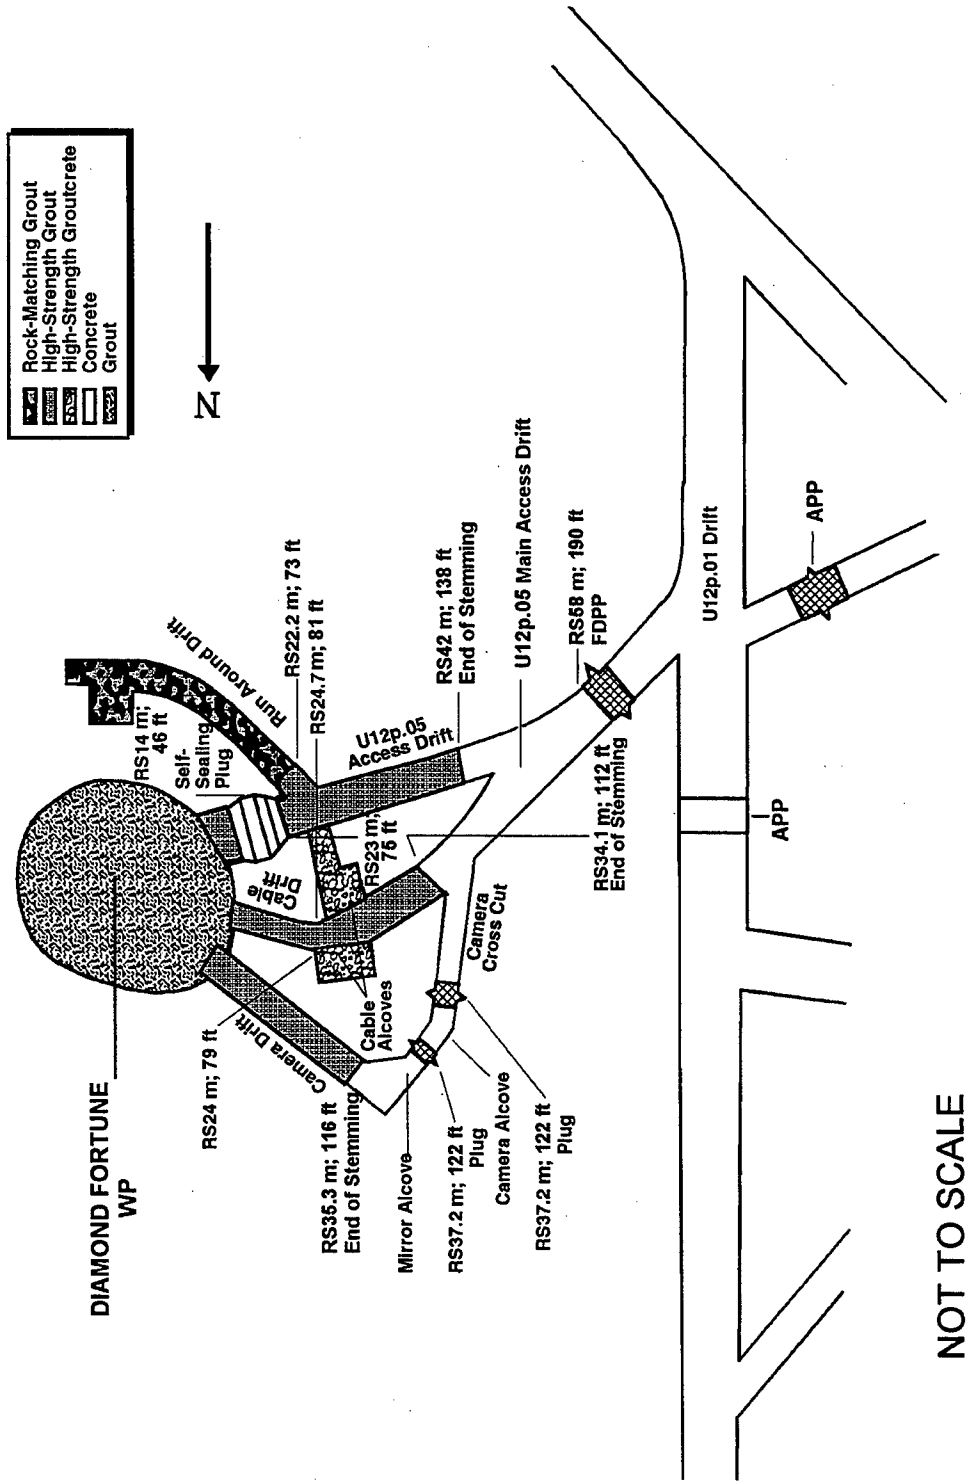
DIAMOND FORTUNE test - stemming plan.
